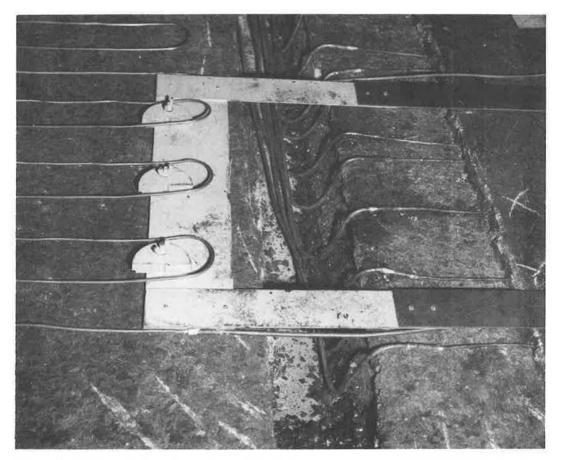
Cold conductors in roadway slot showing template for bridge area cable laying.
